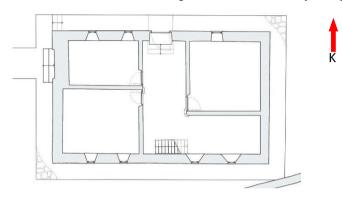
Floor plan of the basement of the house with 137 block, 32 lots (drawn by Aynur Duysak Mankır, Mostar Architecture, 2018)
